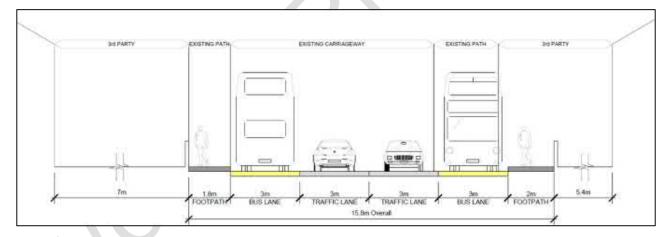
G1b Typical Cross Section for Crumlin Road.
